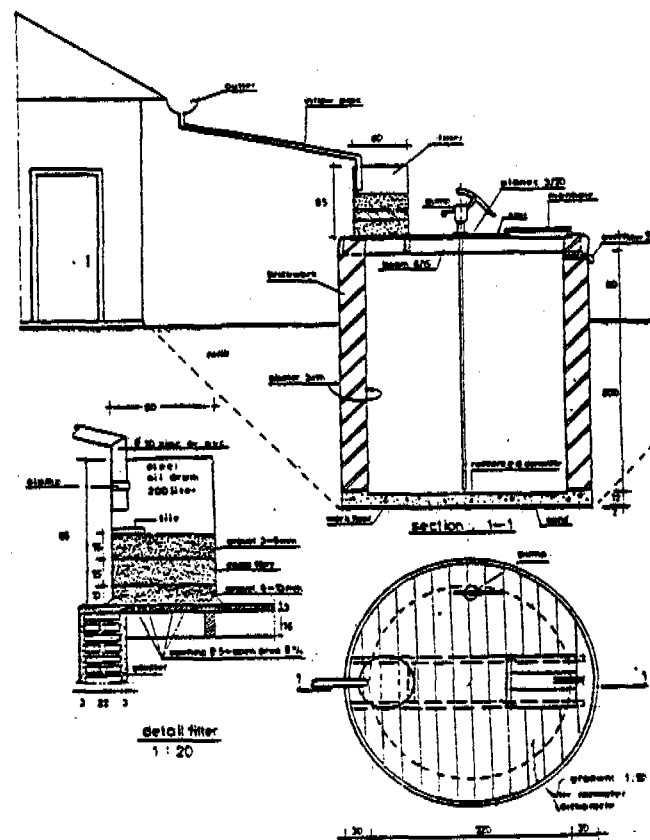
Brick Masonry Rainwater Storage Tank (10,000 litres)
